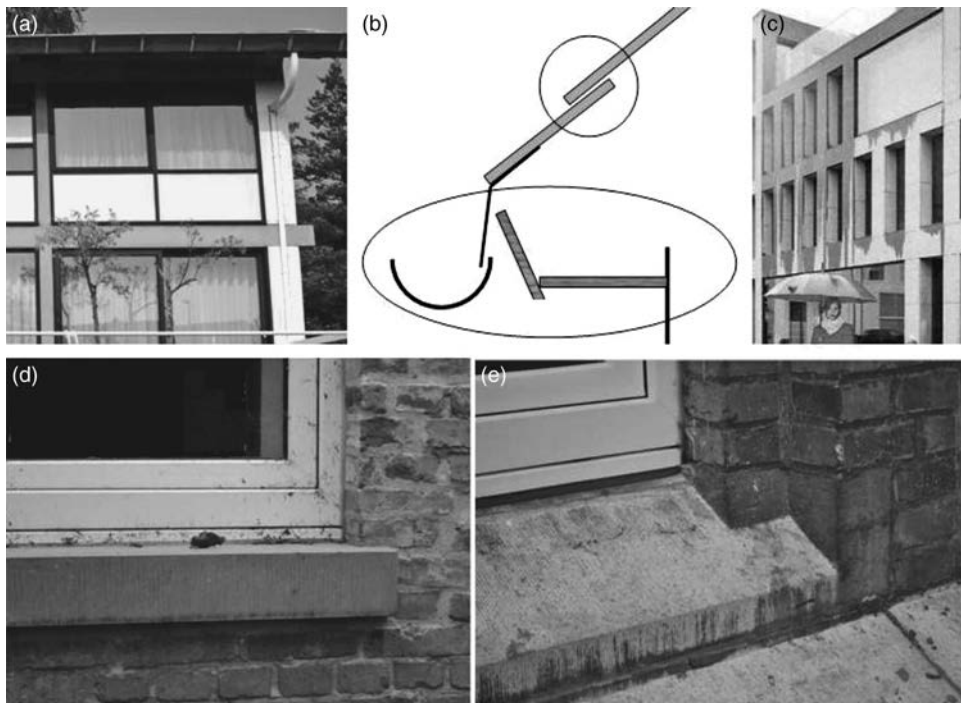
(a) and (b) Roof overhang, (c) no overhang and sills, (d) sill without end and back dam, (e) sill with end and back dam.
